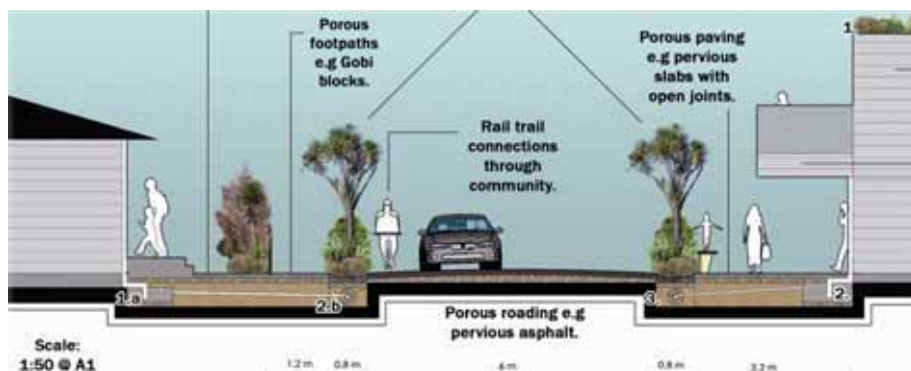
Cross section of narrow street for proposed new Liffey Spring Subdivision in Lincoln Village, South island, New Zealand. Design: Simon Moultrie, 2007
